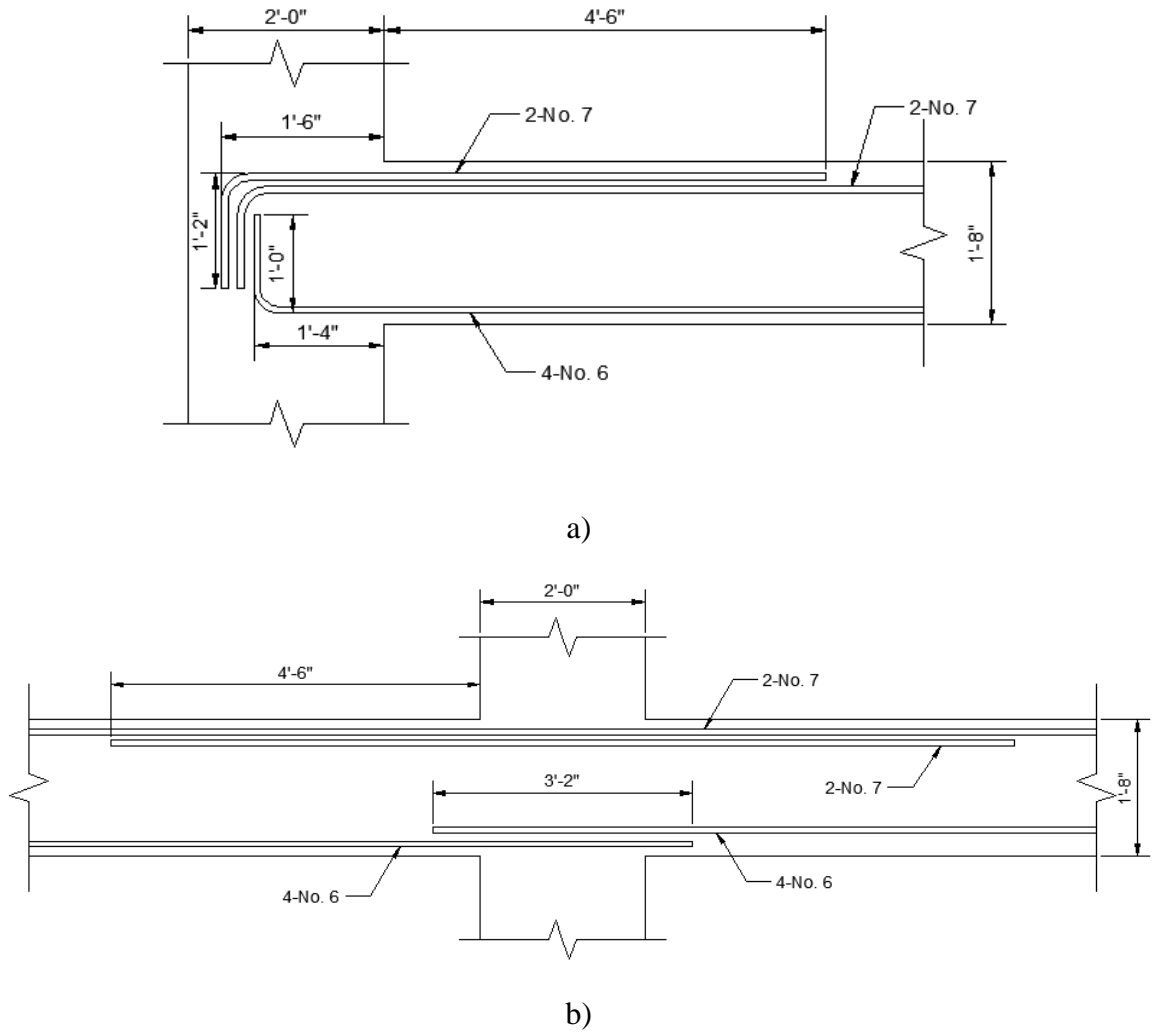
Details of flexural reinforcement a) anchorage at exterior column and b) at interior column (note: stirrups are excluded for clarity)
